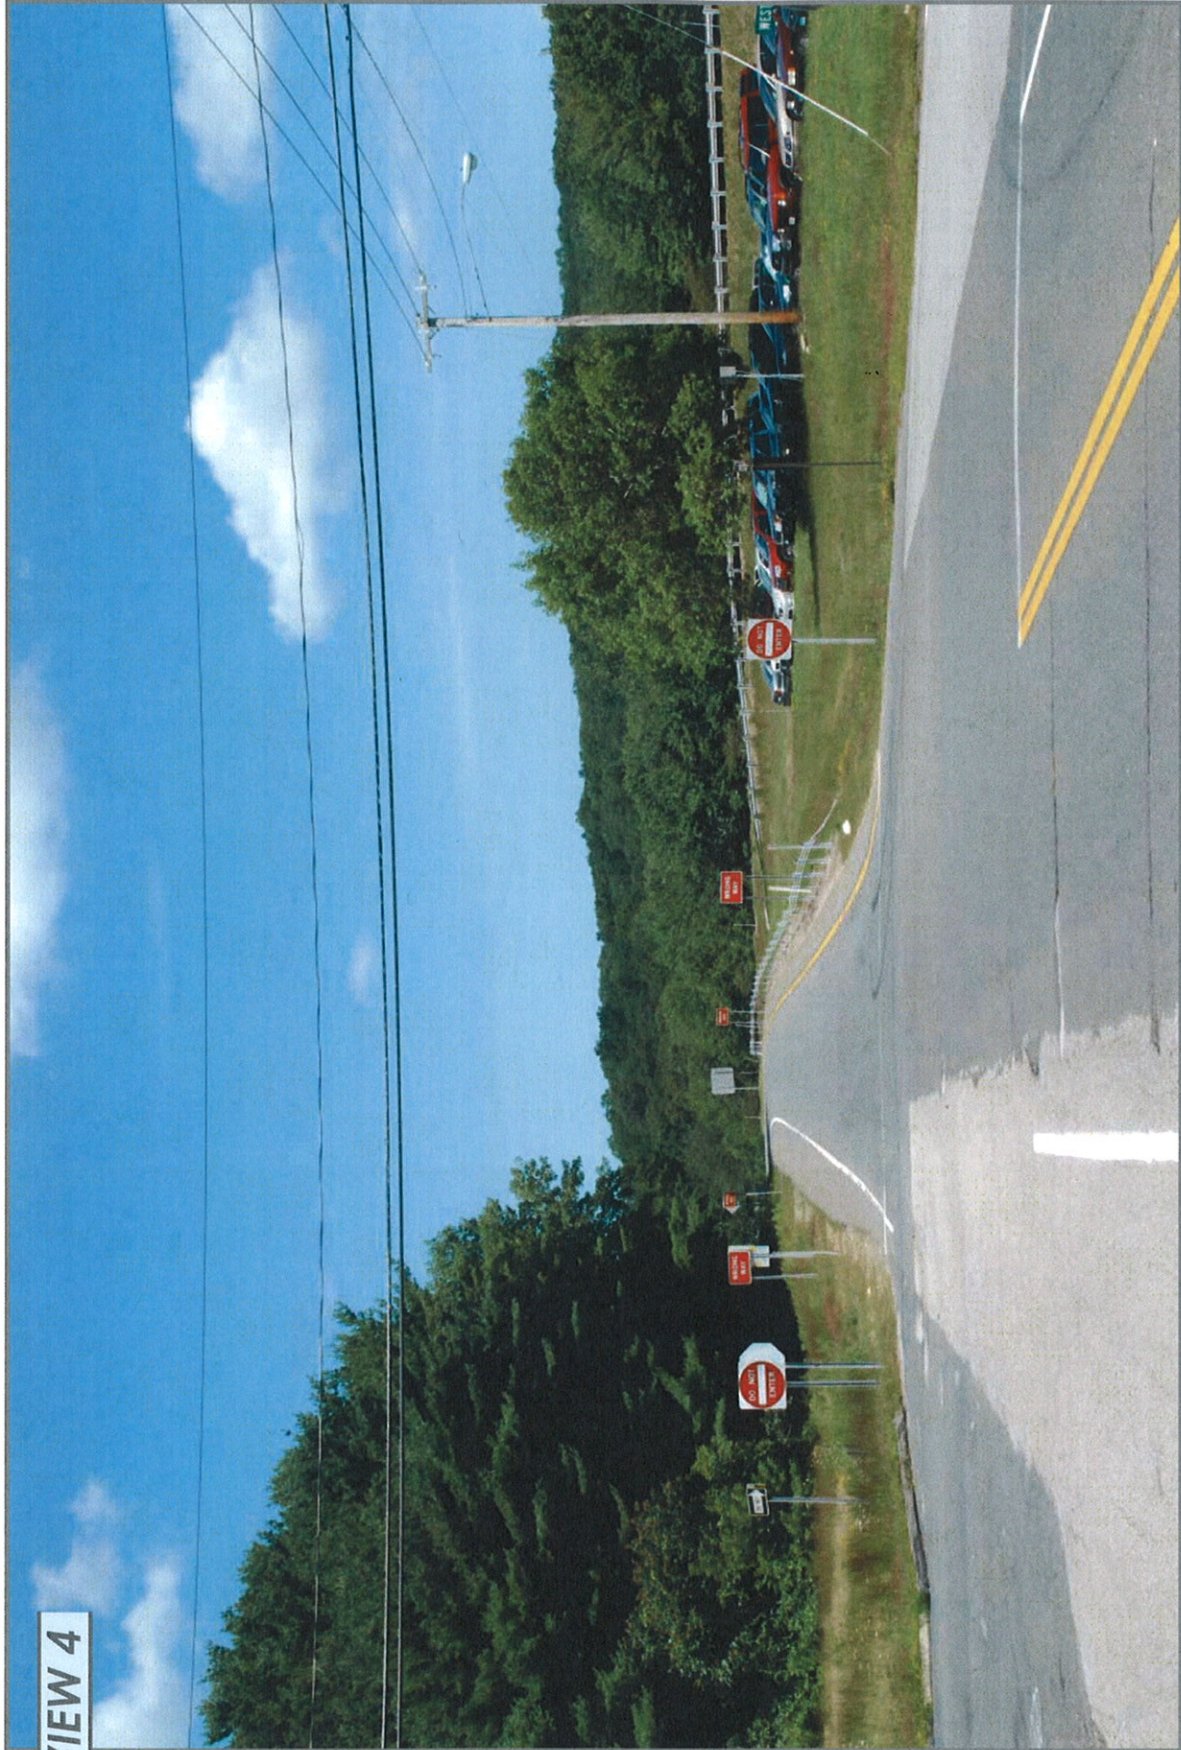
PHOTO TAKEN FROM NORTH MAIN STREET AT PORTLAND ROAD, LOOKING NORTHWEST - BALLOON IS NOT VISIBLE
